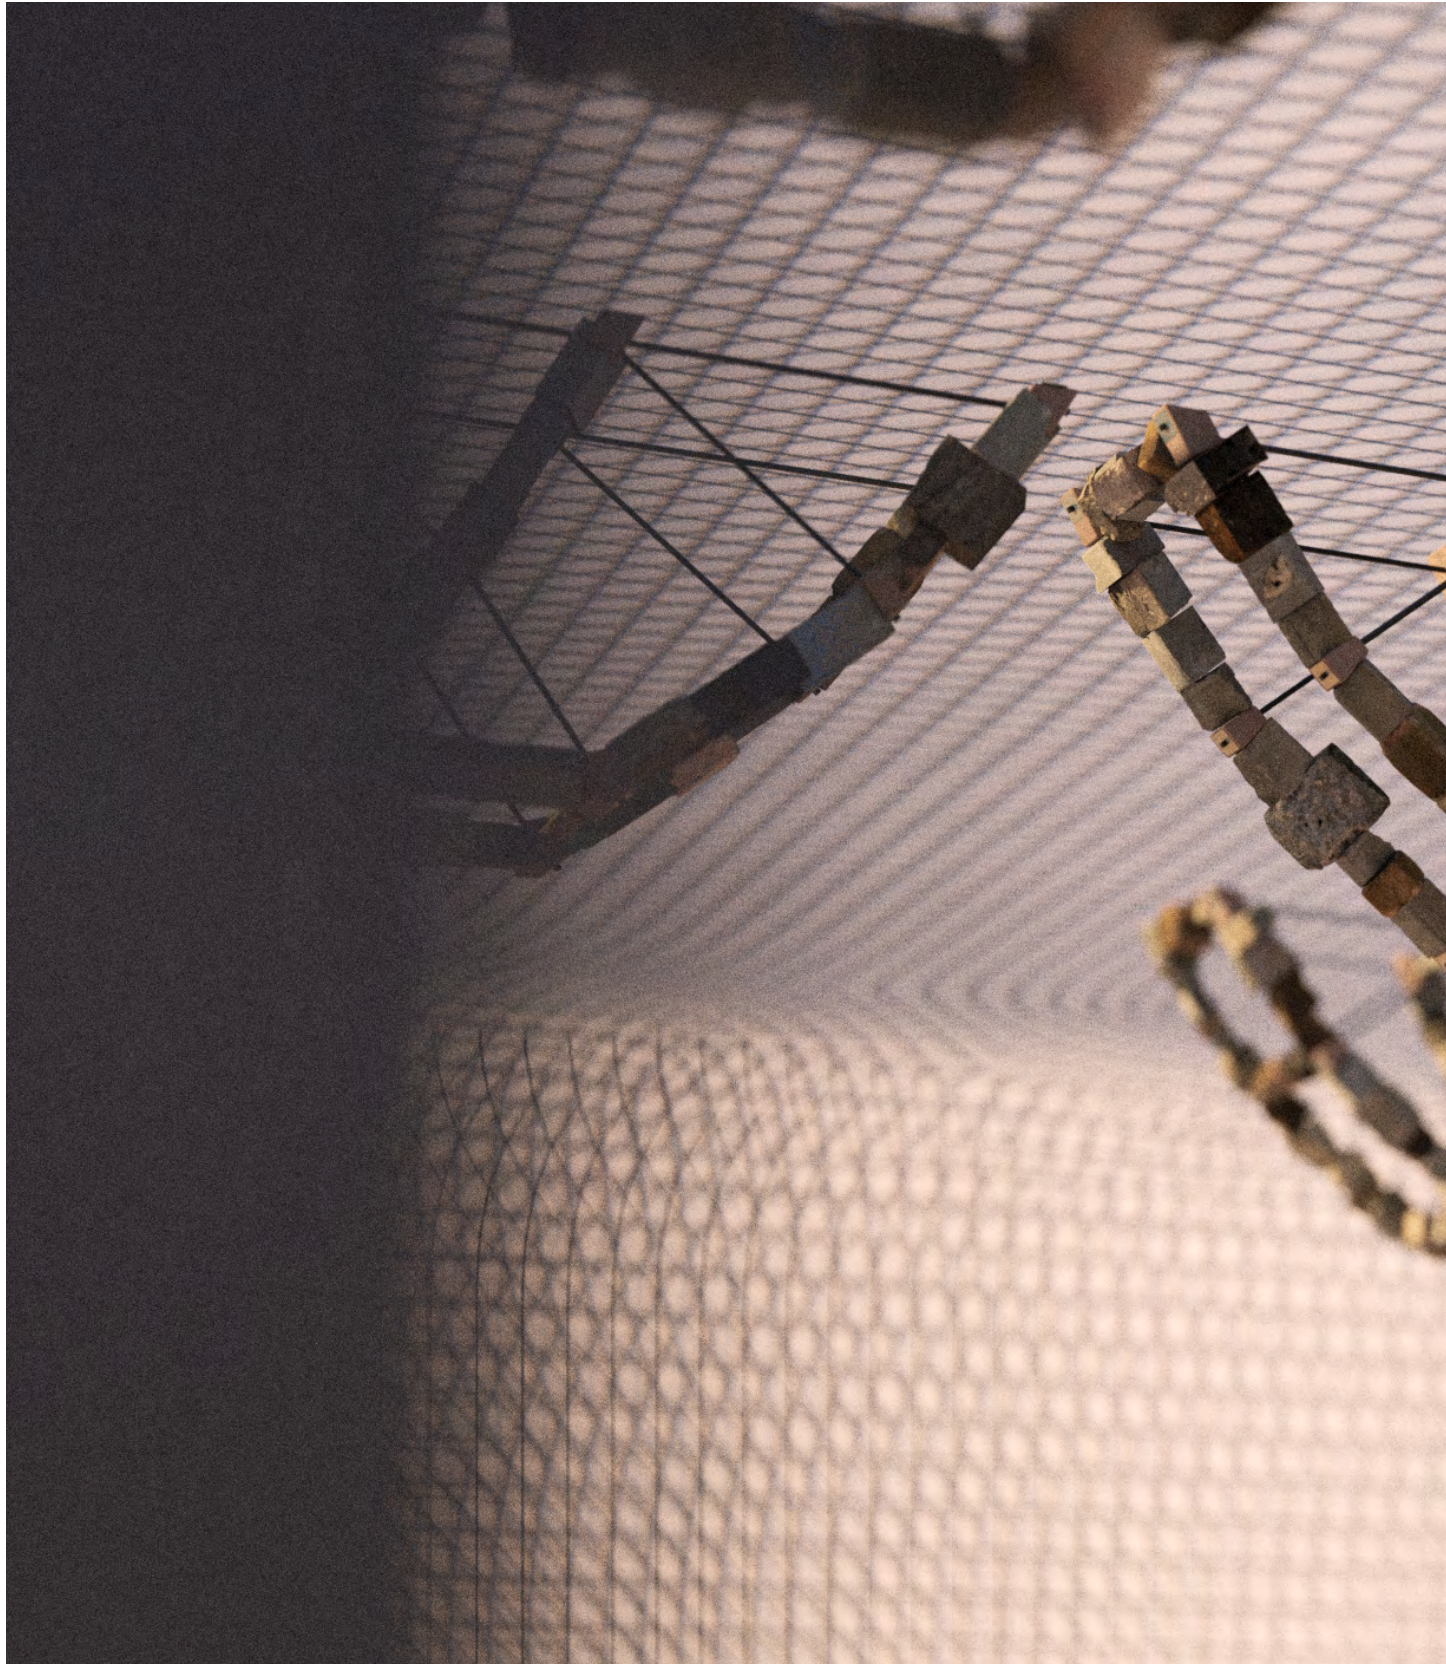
Muharrag Pier Structural elements including the Roof Trusses, Pier Trusses and Carbon Fiber Veil
